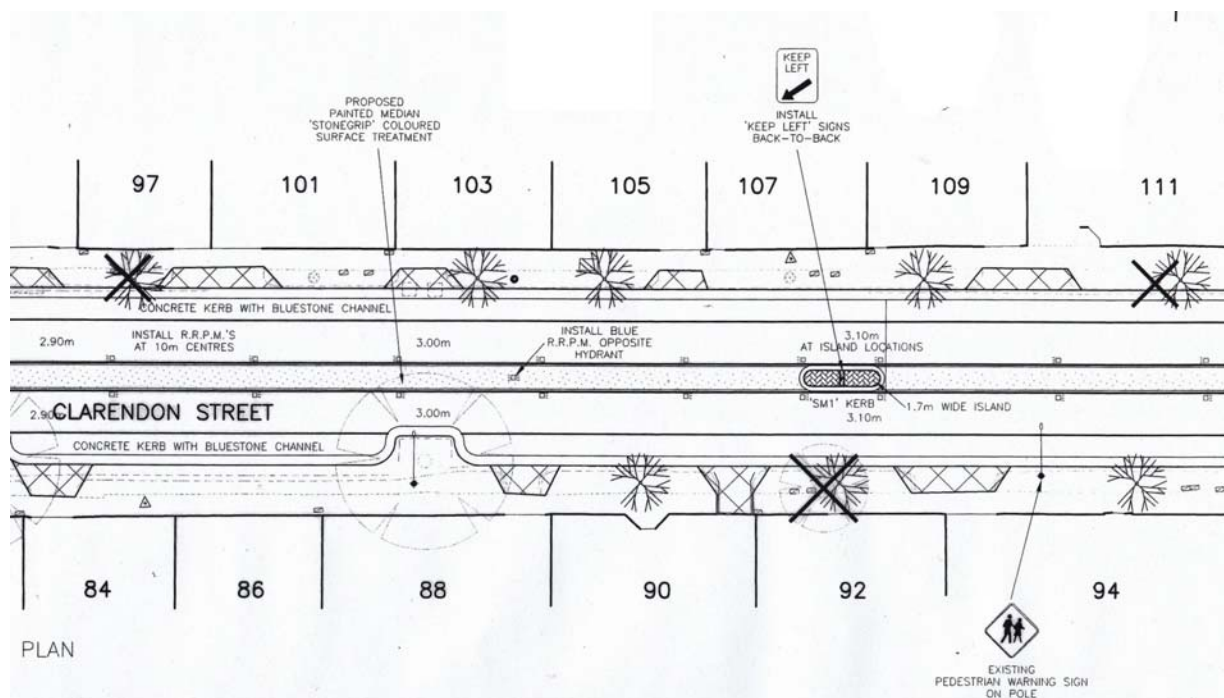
CLARENDON STREET - RECONSTRUCTION DETAILS
